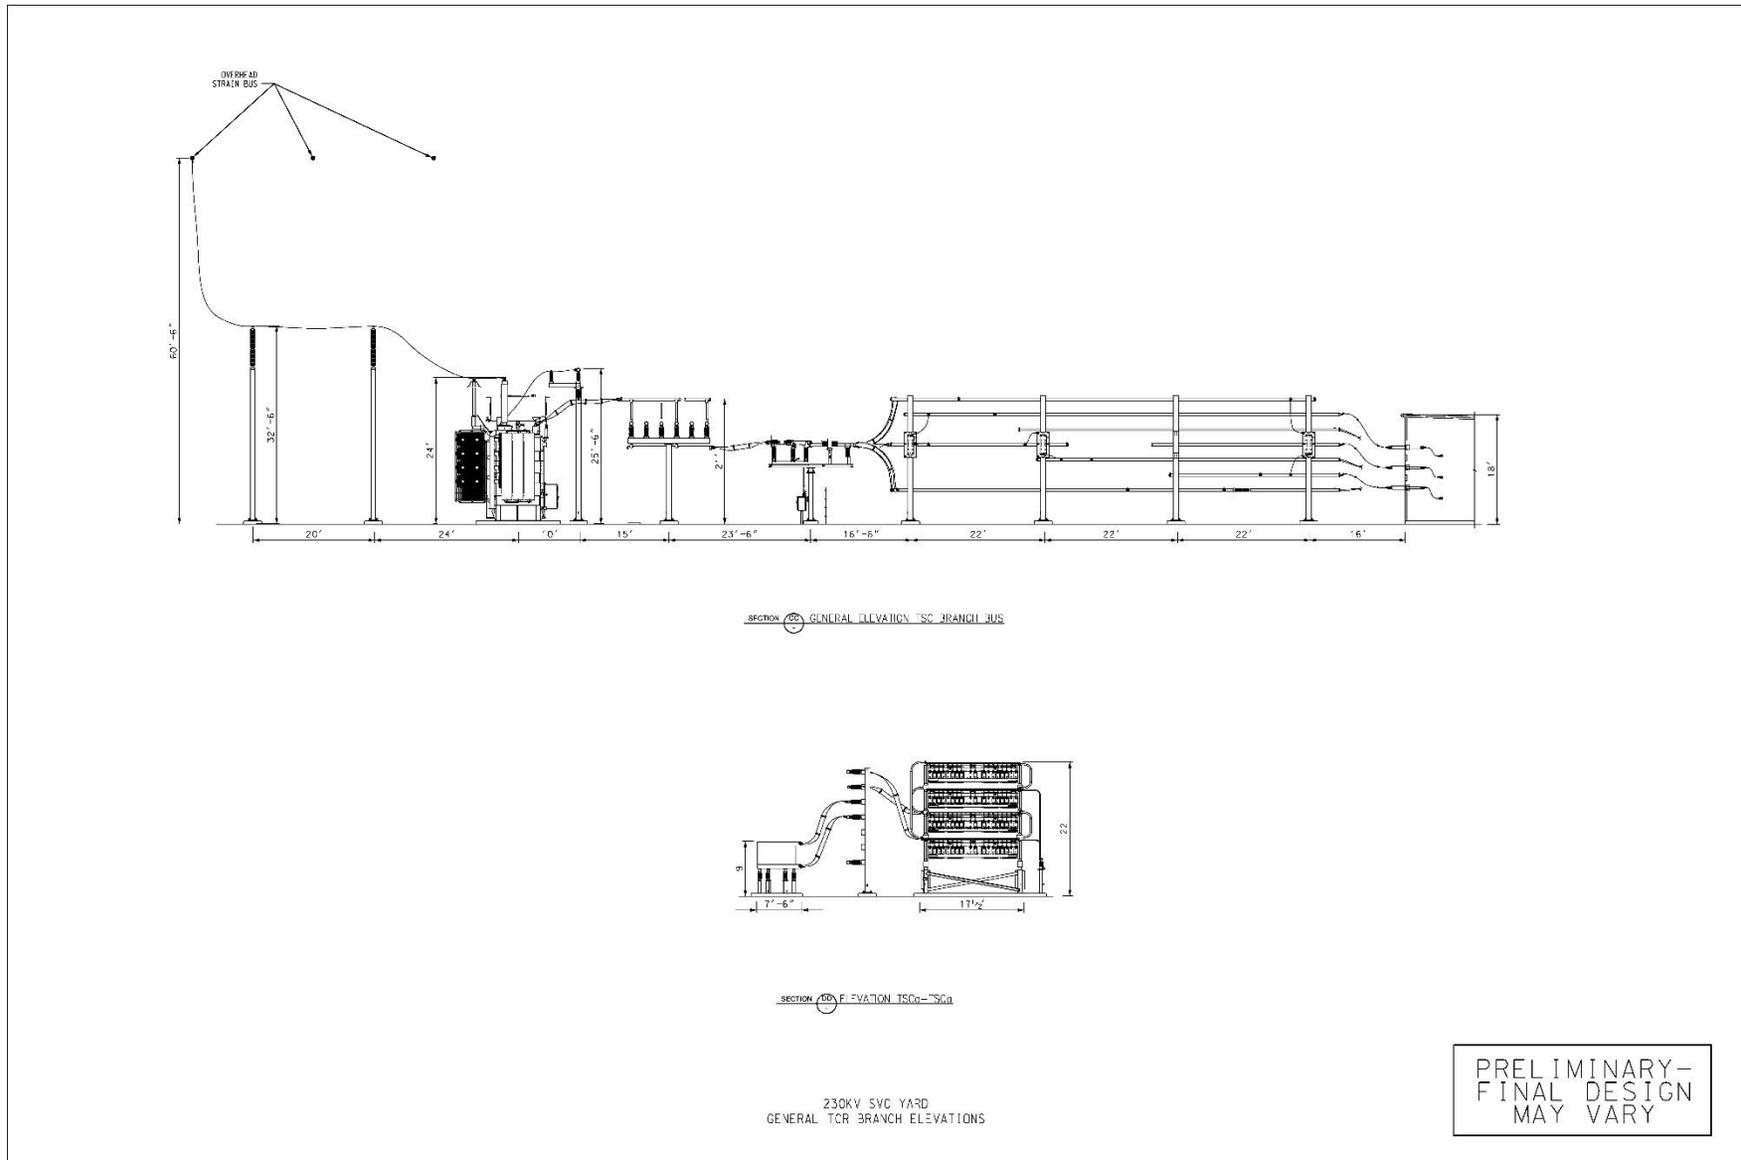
SVC Typical Elevation View (2 of 2)
